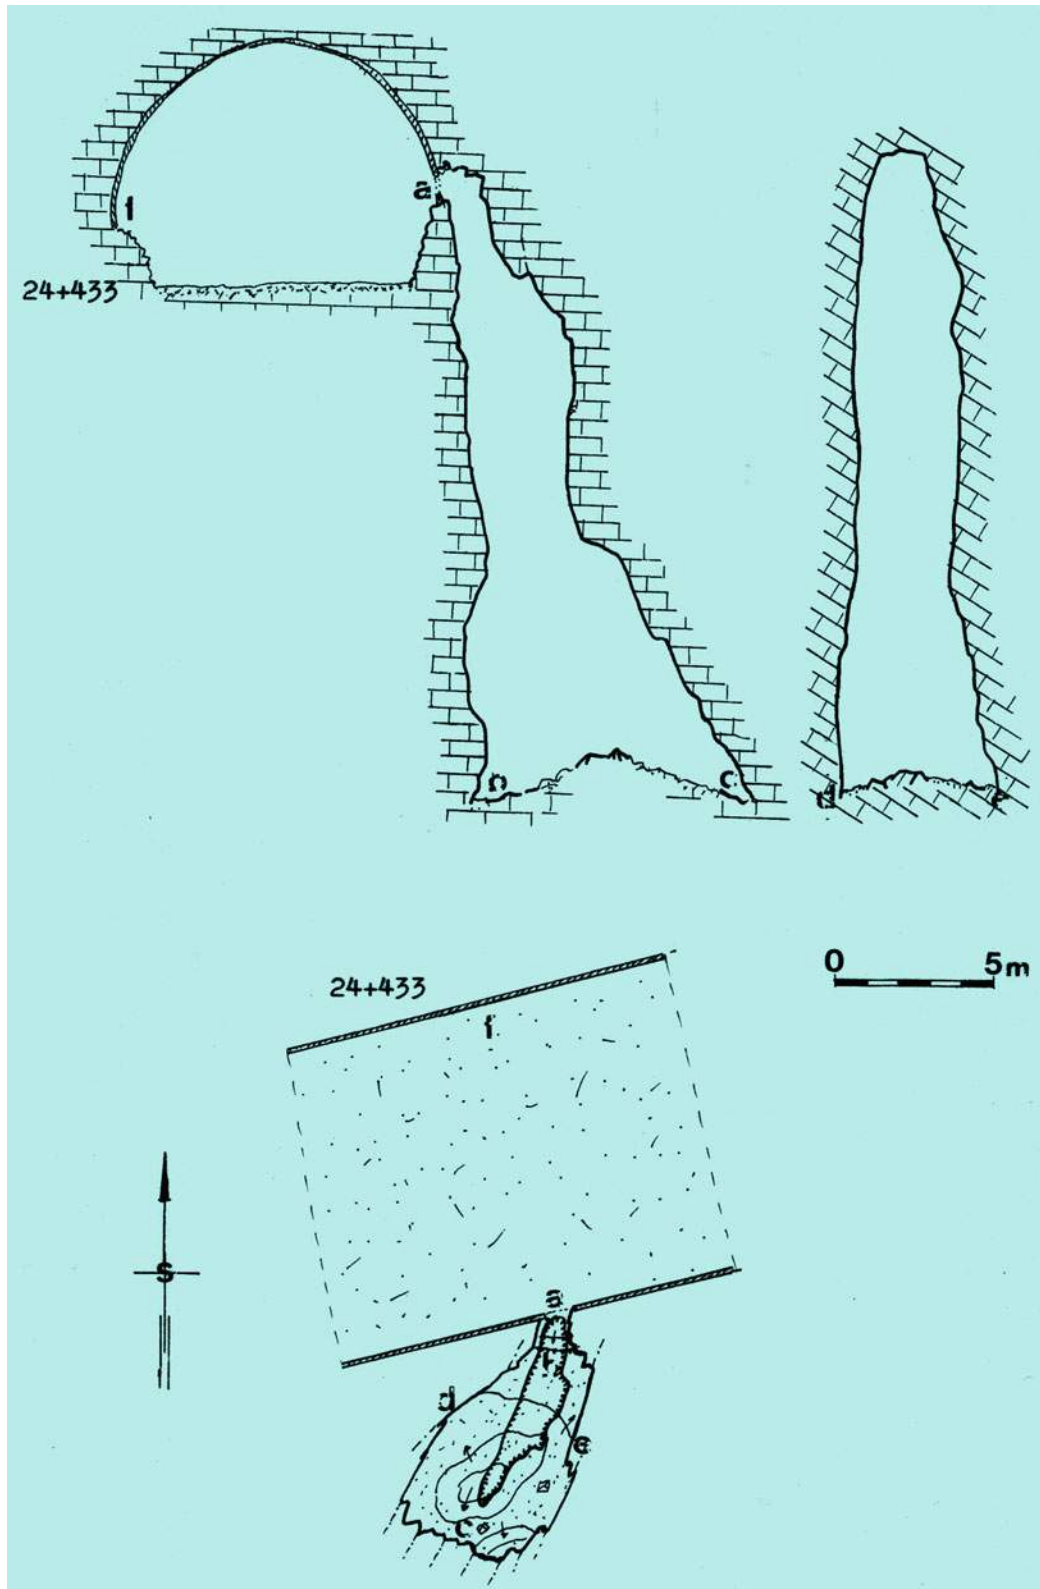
Plan and profile of cavern at km 24 + 433 in Tuhobić Tunnel
